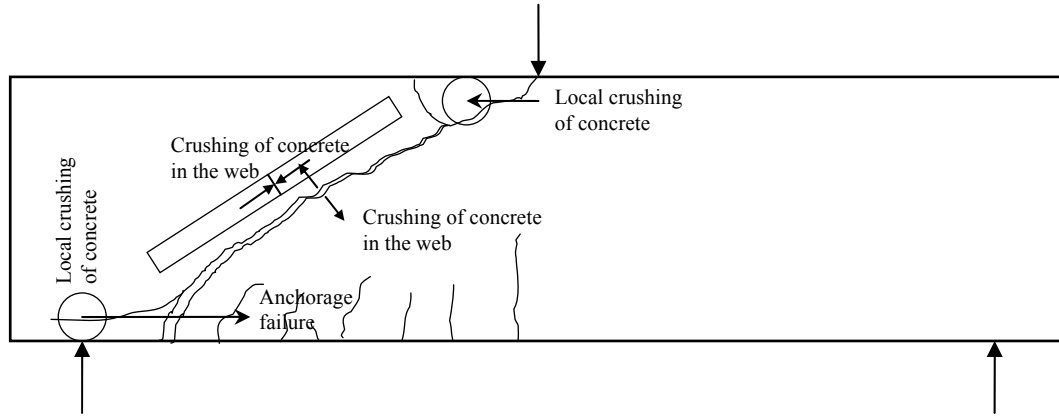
Schematic view of the shear failure of concrete beam
